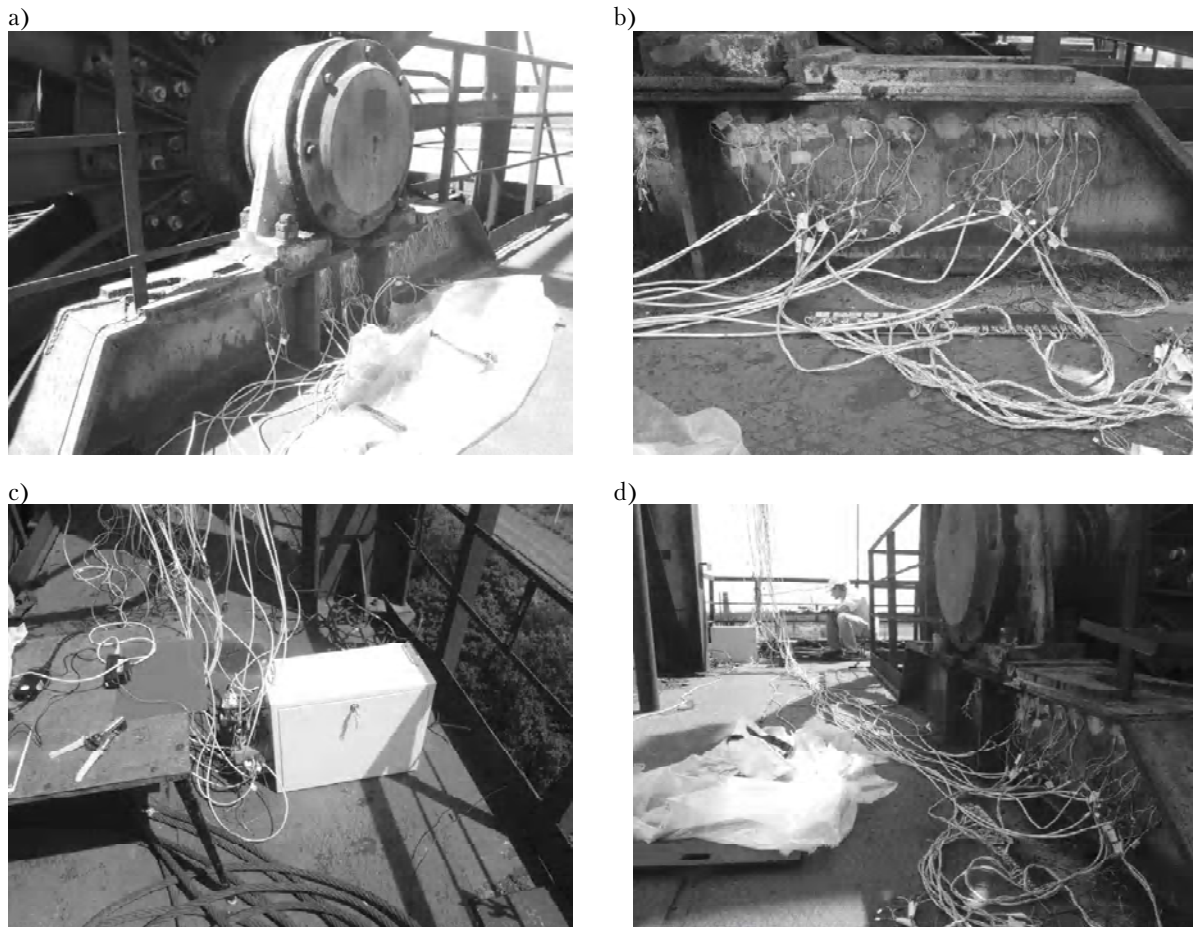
The general view of the measurement instrument layout on the sub-pulley structures: a) the general view of a guide pulley resting joint; b) the layout of the strain gauges; c) the testing equipment layout on the sub-pulley deck; d) the general view of the measurement equipment switching.
